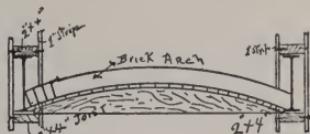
METHOD OF SETTING CENTRES FOR FIREPROOF FLOORS.
